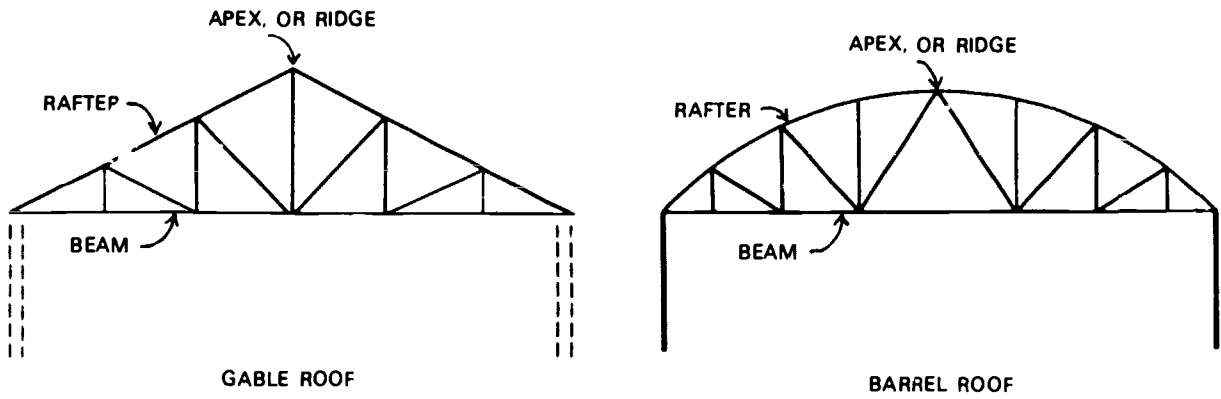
Howe truss (left) and bolstering truss (right)
